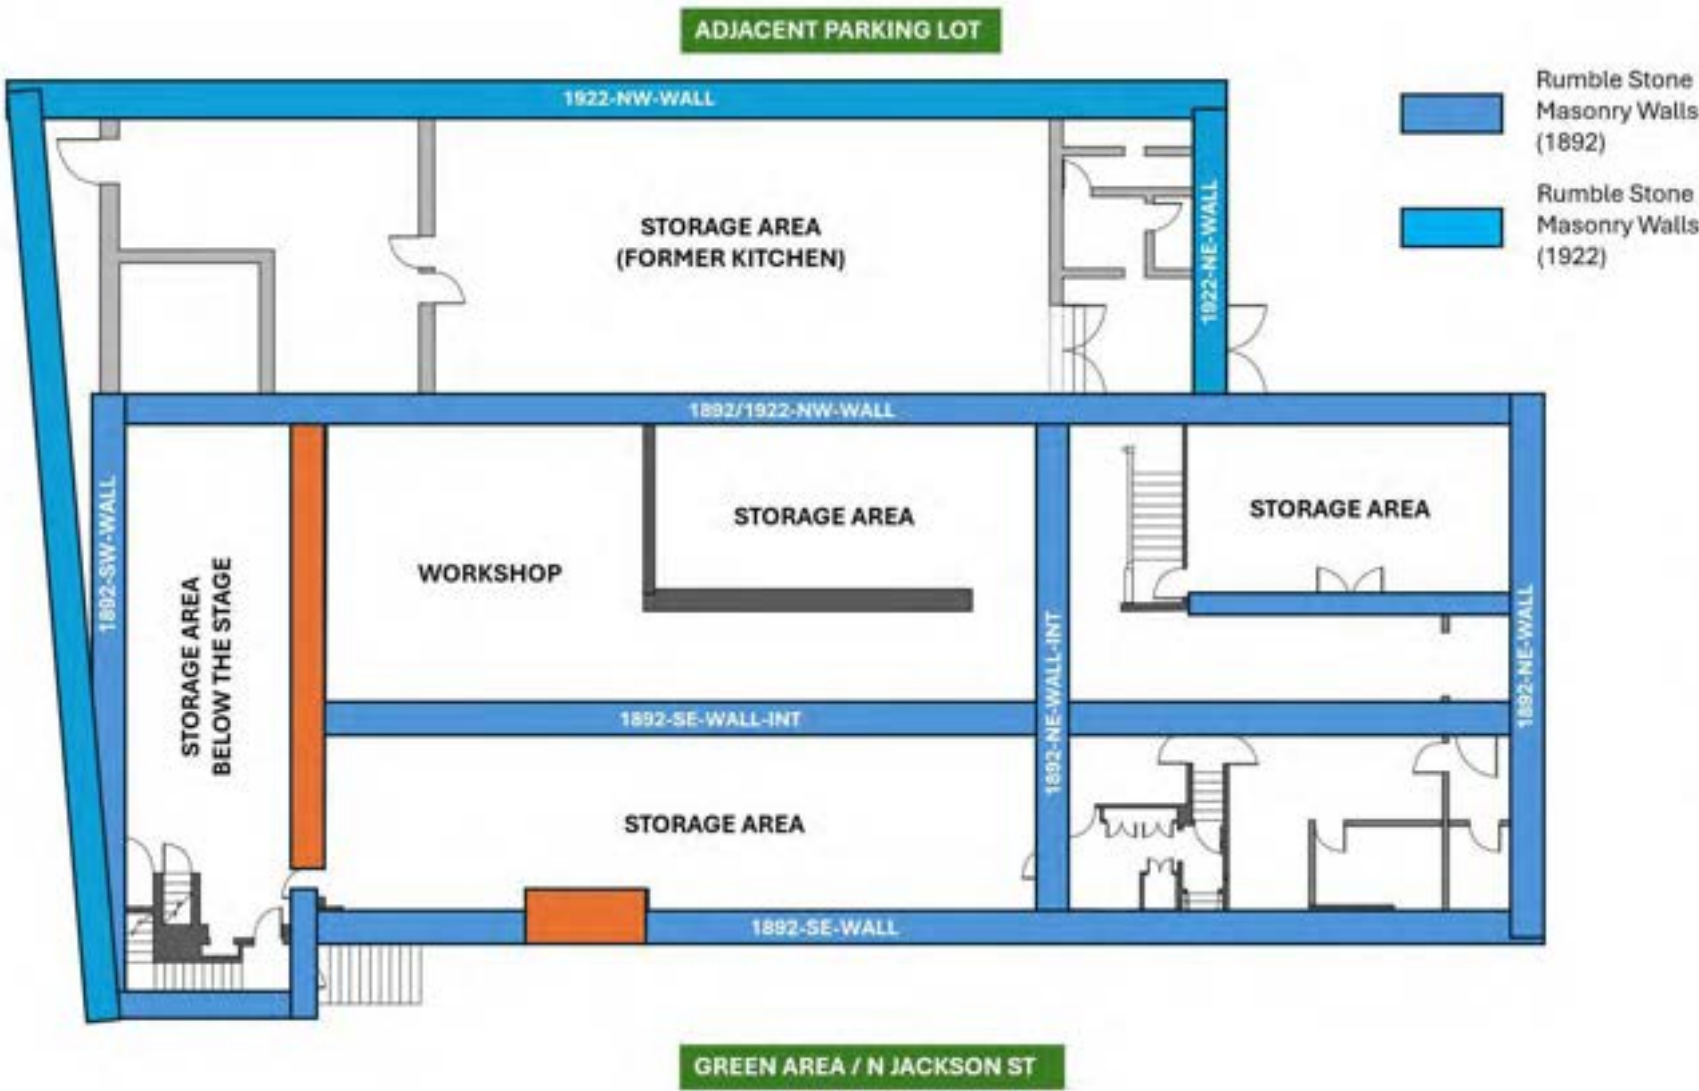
Plan of basement layout (Studio group, 12/15/2024)
